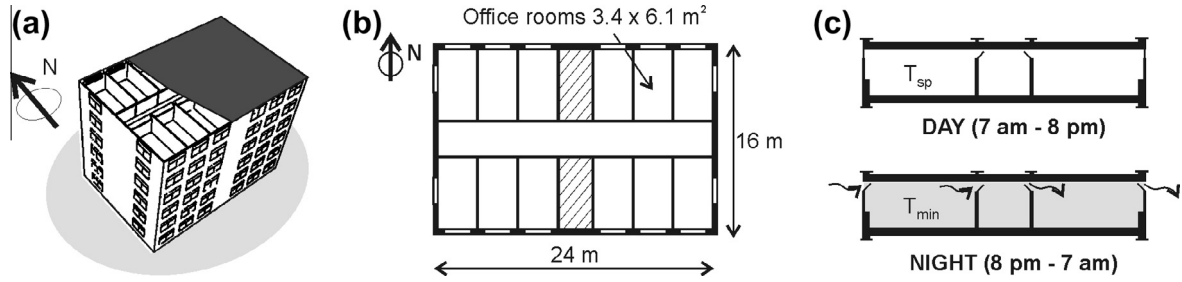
(a) Building geometry, (b) plan of a typical floor with 12 office rooms sized $3.4 \times 6.1 \text{ m}^2$ (in white the occupied zones), and (c) schedules of the natural ventilation system. During the day, windows are closed and the cooling set point temperature (T_{sp}) is $26 \text{ }^\circ\text{C}$ for the Italian locations and $25 \text{ }^\circ\text{C}$ otherwise. During the night, the ventilation is active and a minimum indoor temperature (T_{min}) of $18 \text{ }^\circ\text{C}$ is imposed to avoid excessive cooling.
